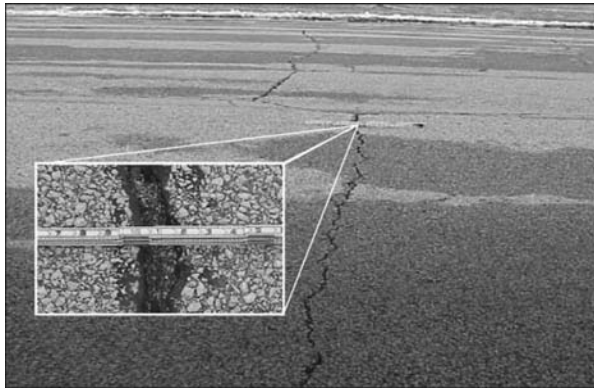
Thermal crack in existing pavement at Peoria Airport prior to placement of overlay.
